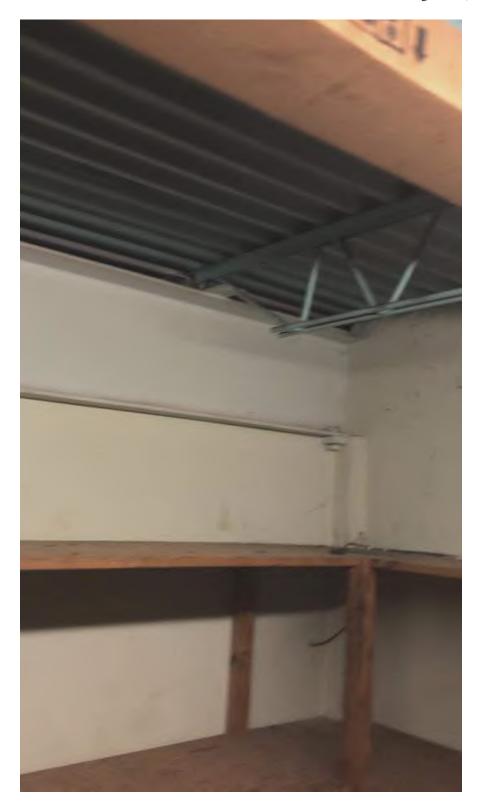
STEEL JOIST ON STEEL GIRDER BETWEEN APPARATUS BAY AND STORAGE ROOM
